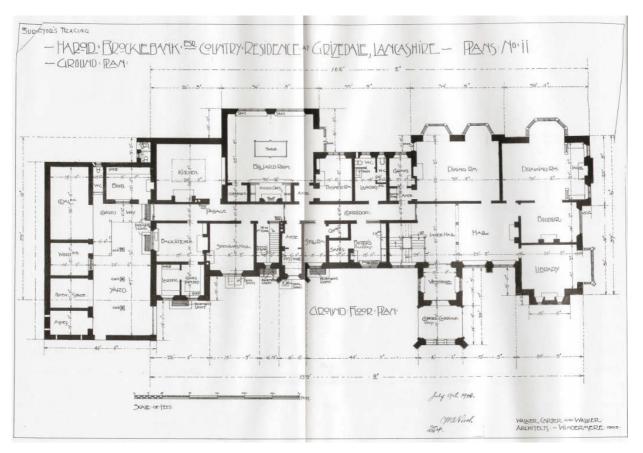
Internal floor plan of the second New Hall, built in 1906.
